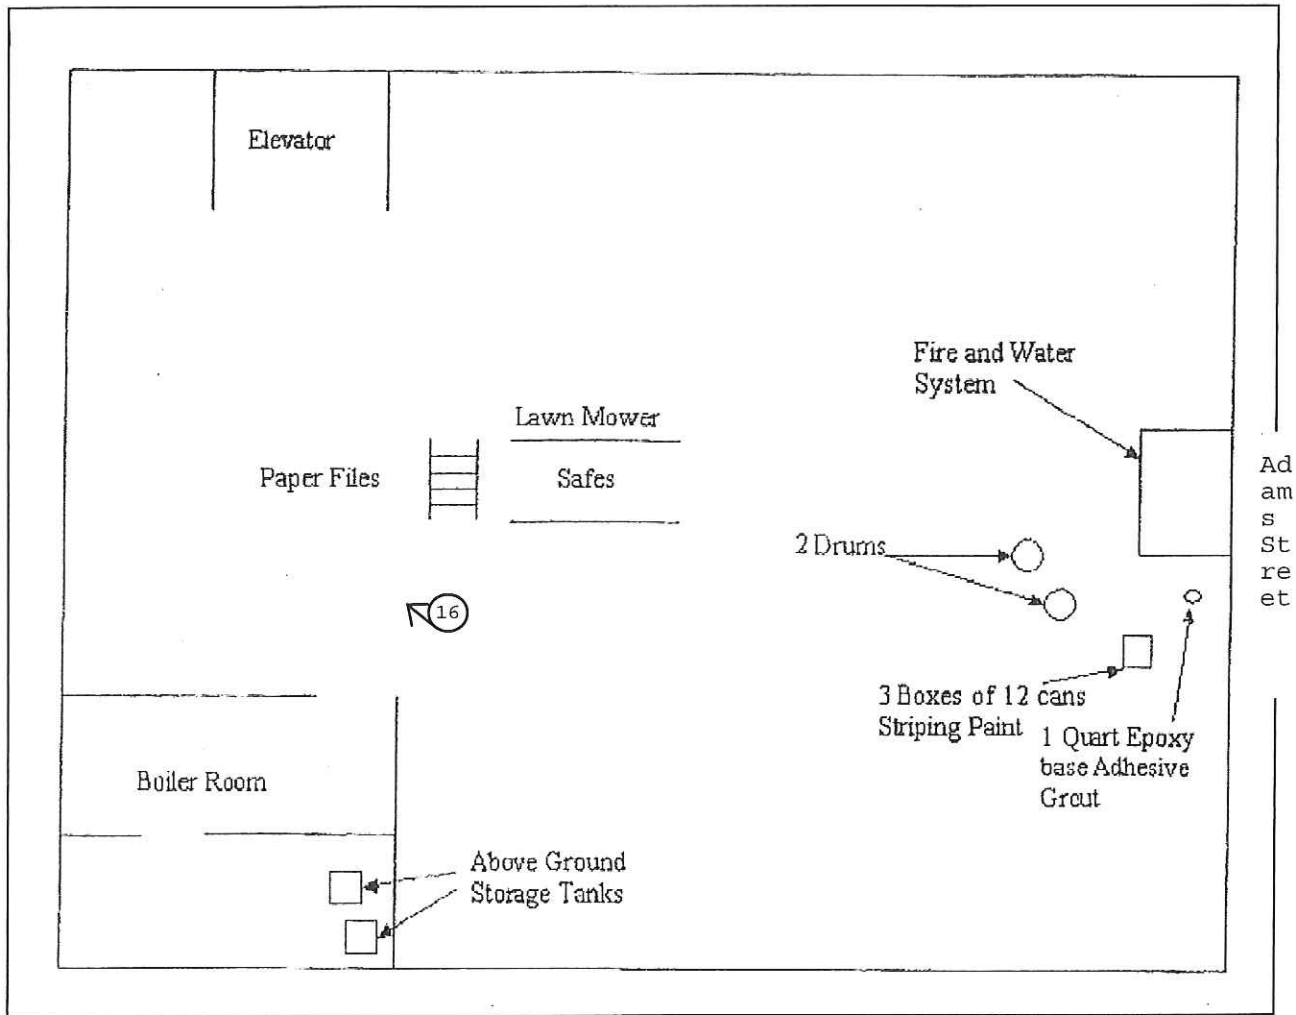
Basement Schematic Plan for 1301 Adams Street, showing location of photograph 16
